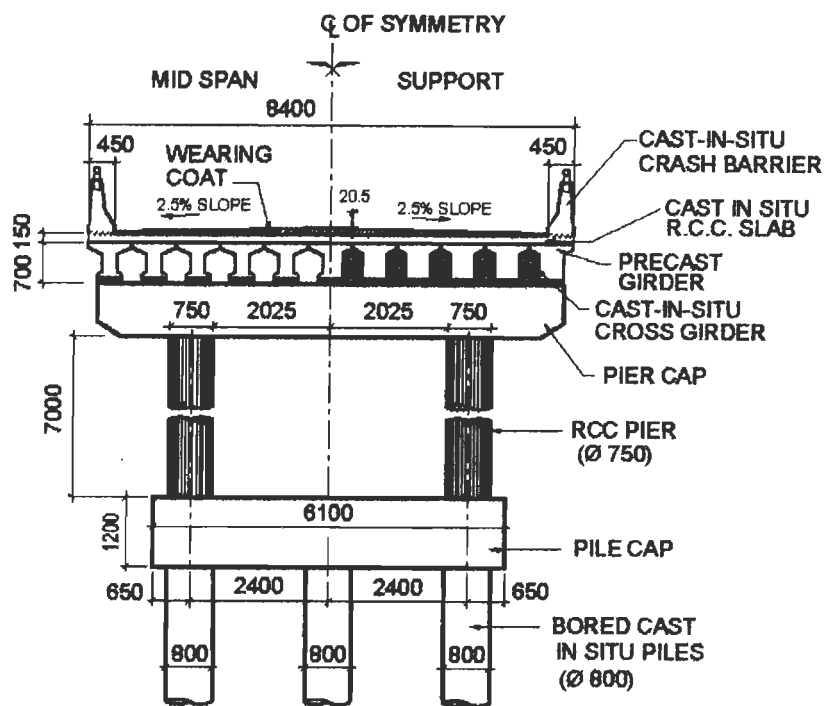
Cross-section of cast-in-situ piles, piers and precast girders used in integral bridge (Courtesy-Tandon Consultants Pvt. Ltd)
